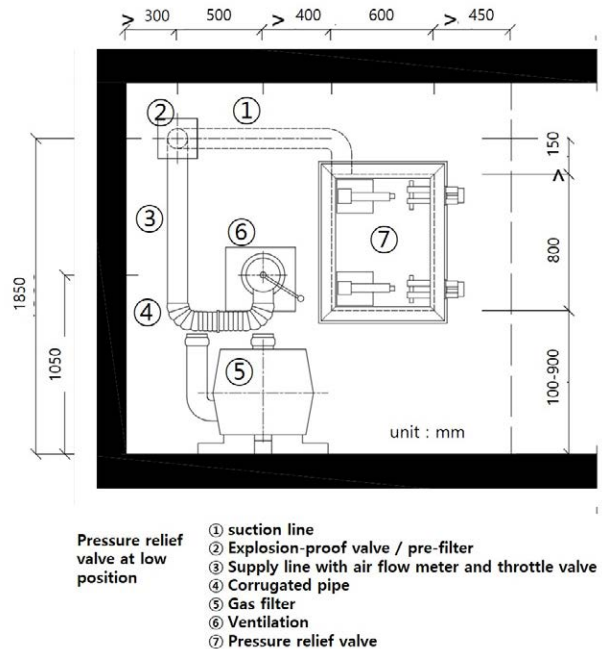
Elevation view of the ventilation system(VA) located on the wall
